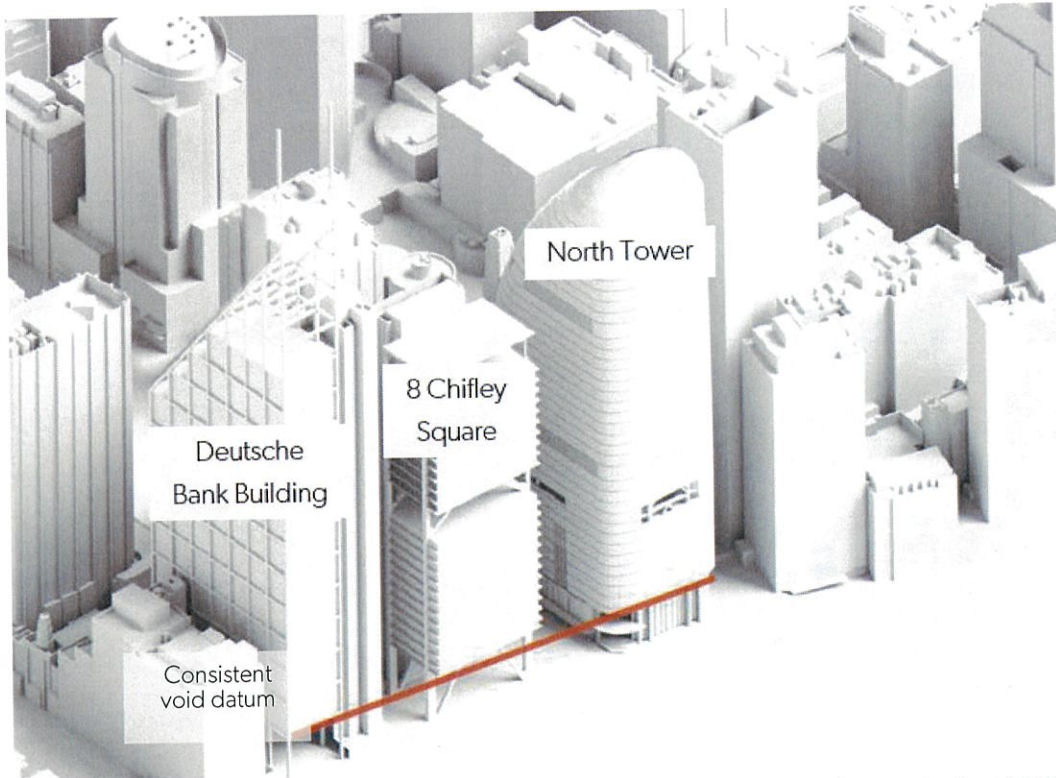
| Modelling of ‘reverse podiums’ and towers along south side of Hunter Street (Source: Applicant’s RTS)
